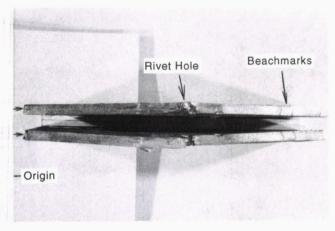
Crack surface of Tie Plate 3 showing beachmarks, rivet hole, and crack origin.
